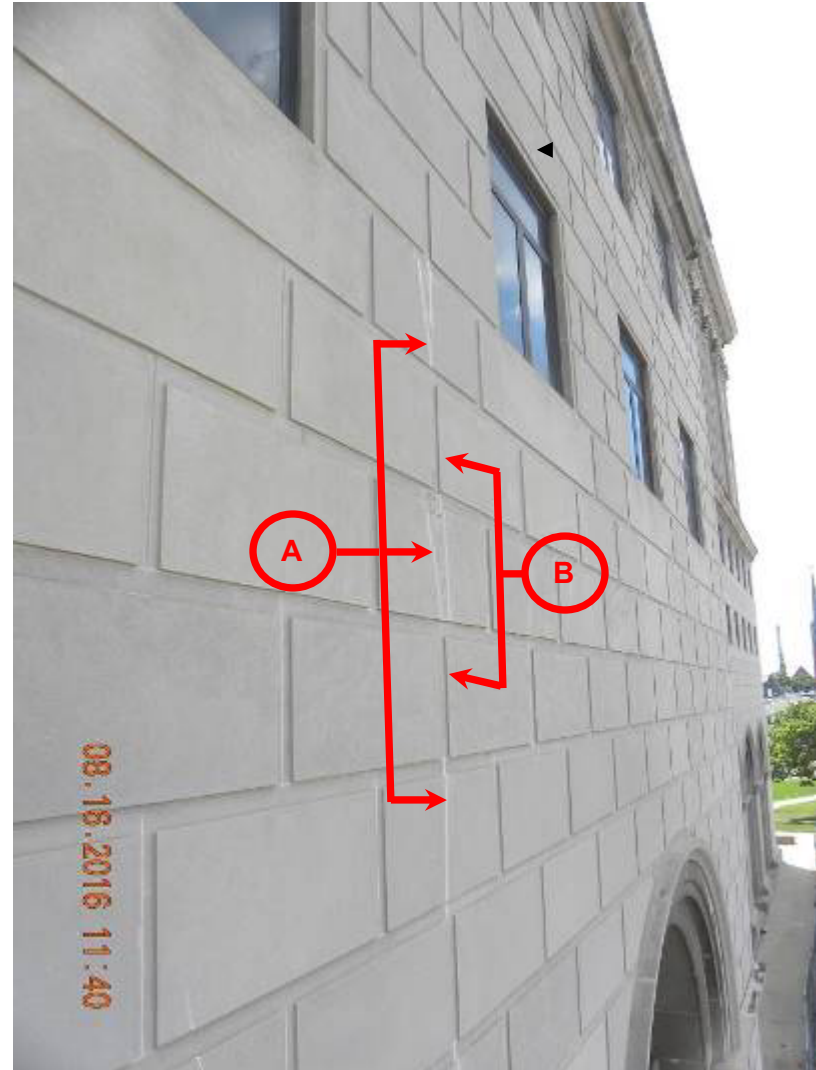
Continuous cracks (A) and separations in vertical mortar joints between cracked units (B) indicate ongoing distress within the walls.
